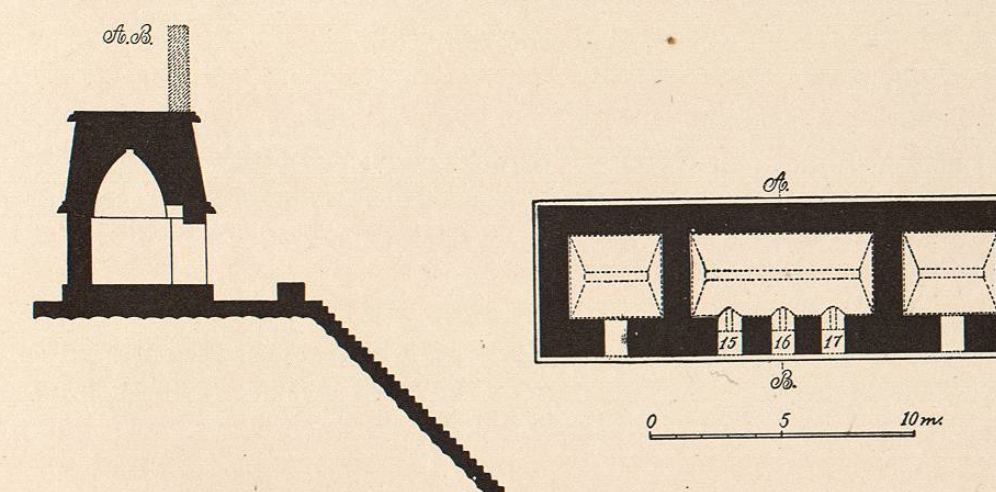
STRUCTURE 21: SECTION AND GROUND-PLAN (RESTORED).
